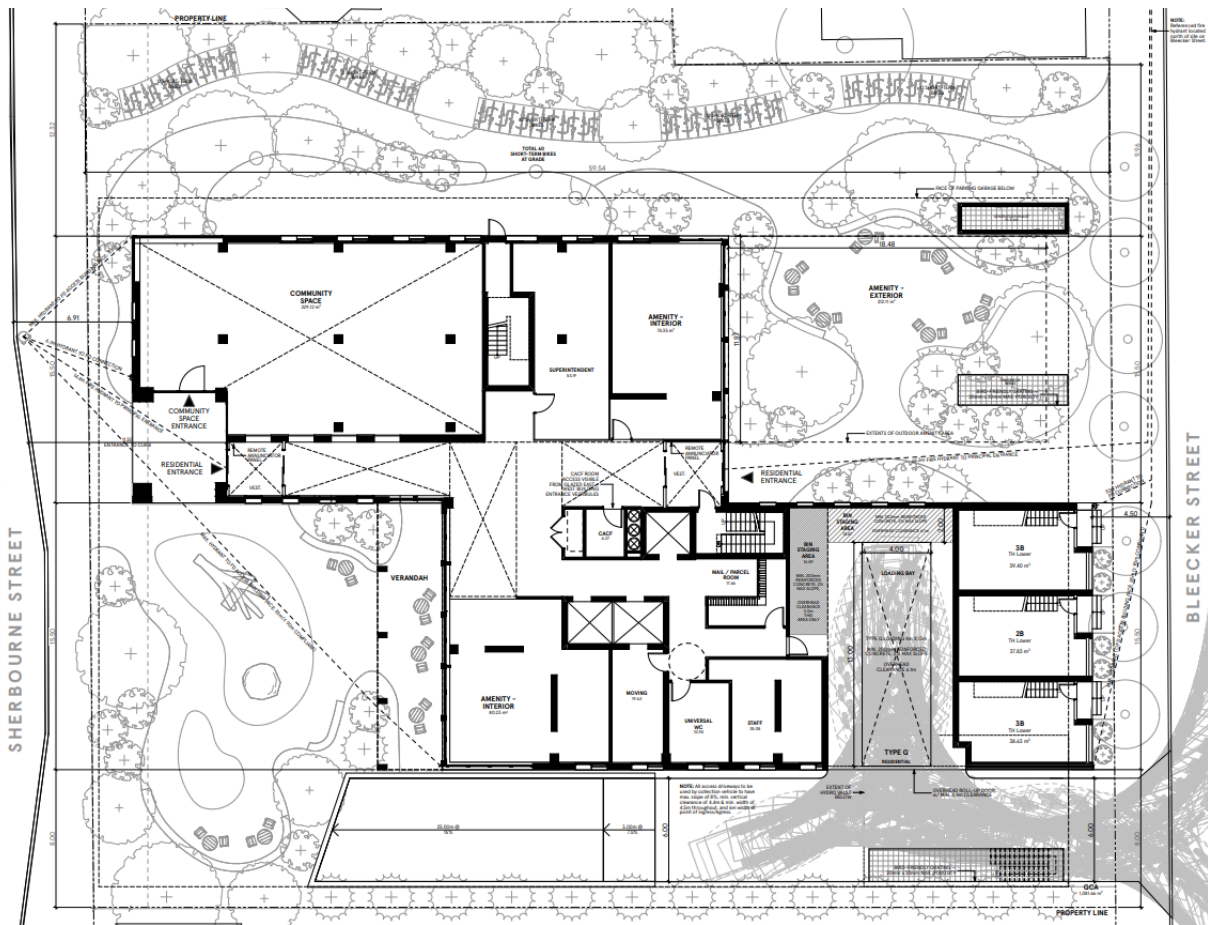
Proposed ground floor for 405 Sherbourne Street (architects-alliance, Alison Brook Architects Inc., 2025).
